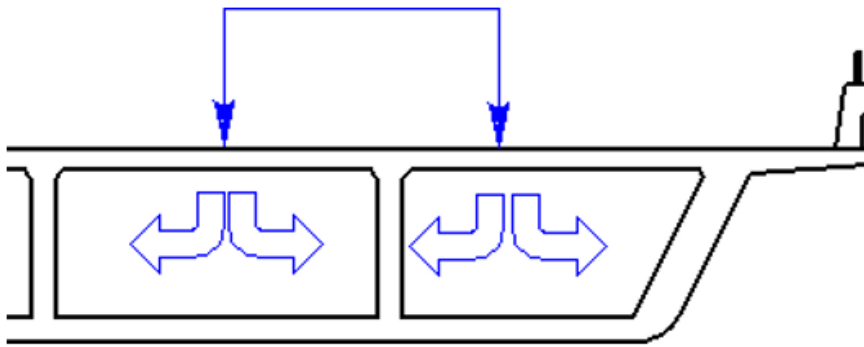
Truck Load Path from Deck Slab to Girders
